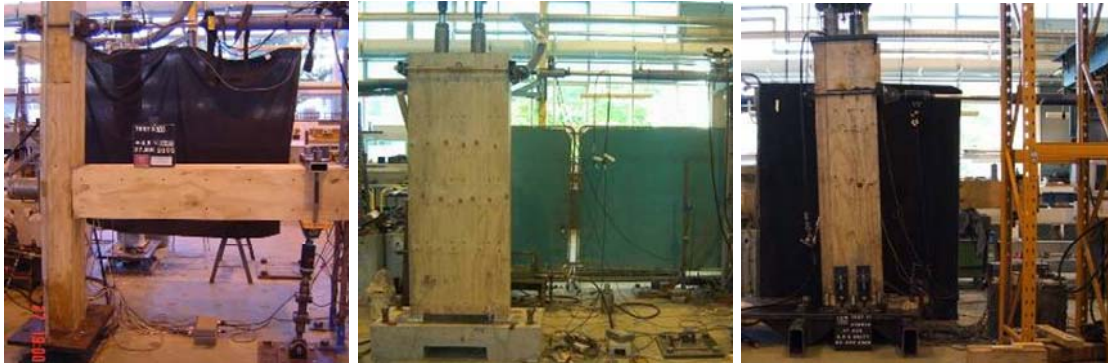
Test set-up of Exterior beam-column, wall-to-foundation, column-to-foundation specimens.
